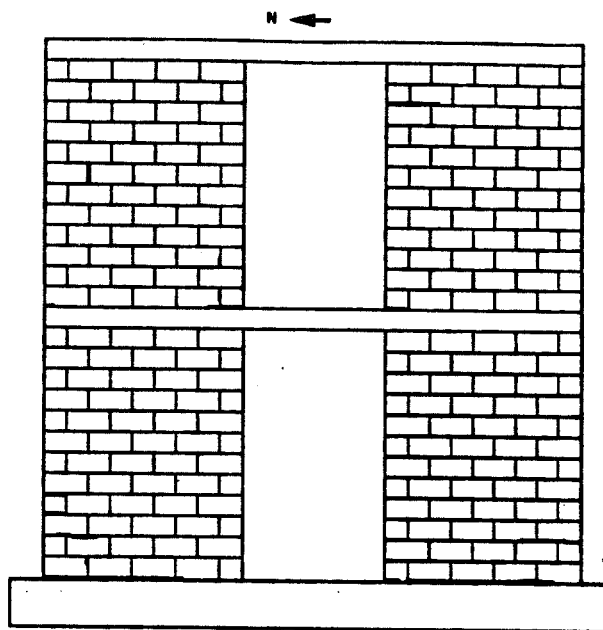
Sp. 2a: Progression of Wall Cracking at Load Point 135
